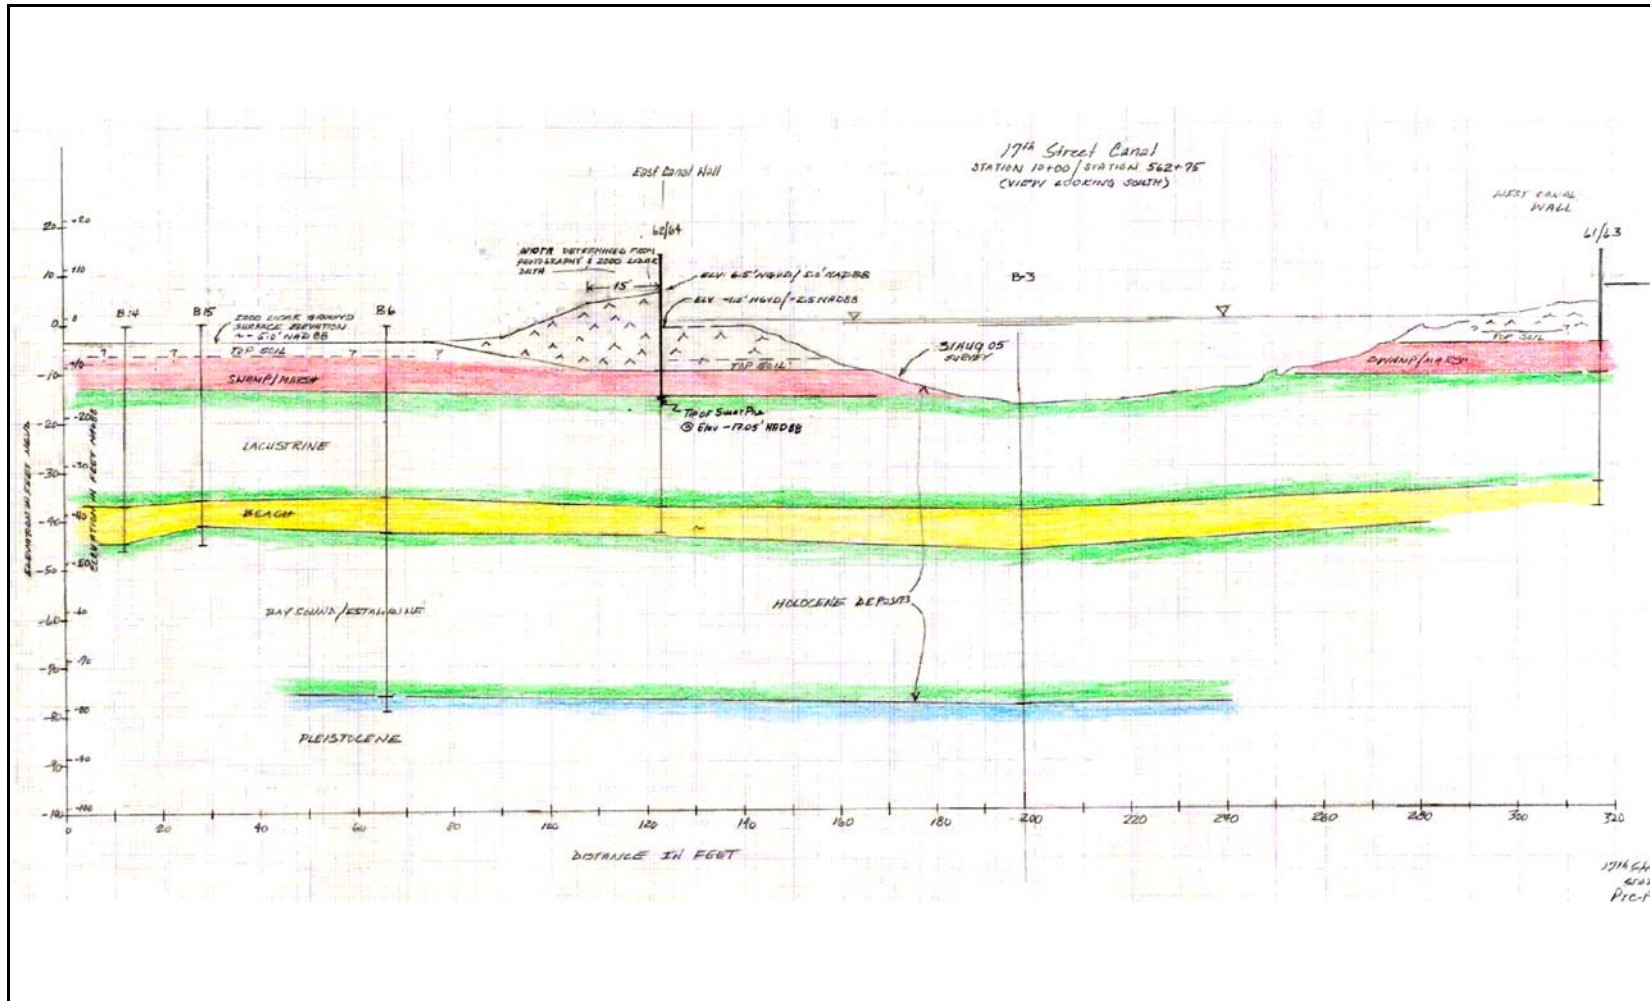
Prefailure Cross-Section at Sta 10+00 (New Stationing)/ Sta. 562+75 (GDM Stationing)
